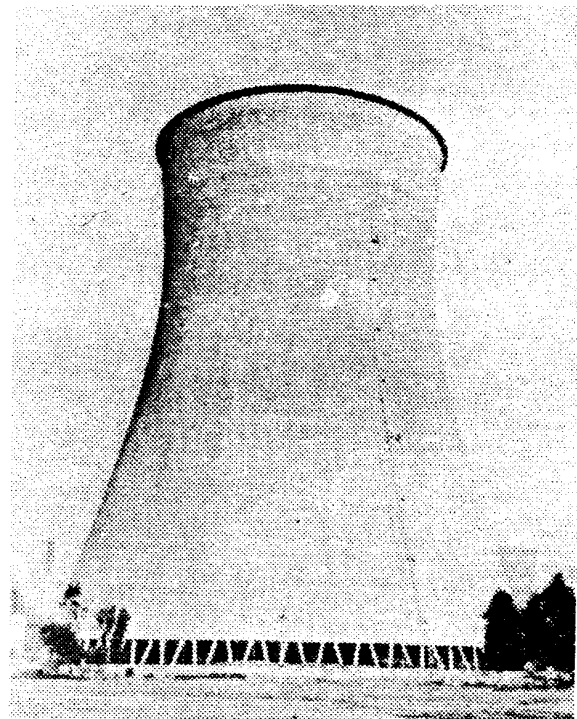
141m High Cooling Tower at Panipat Thermal Power Station Stage III, Tallest in the Country.
